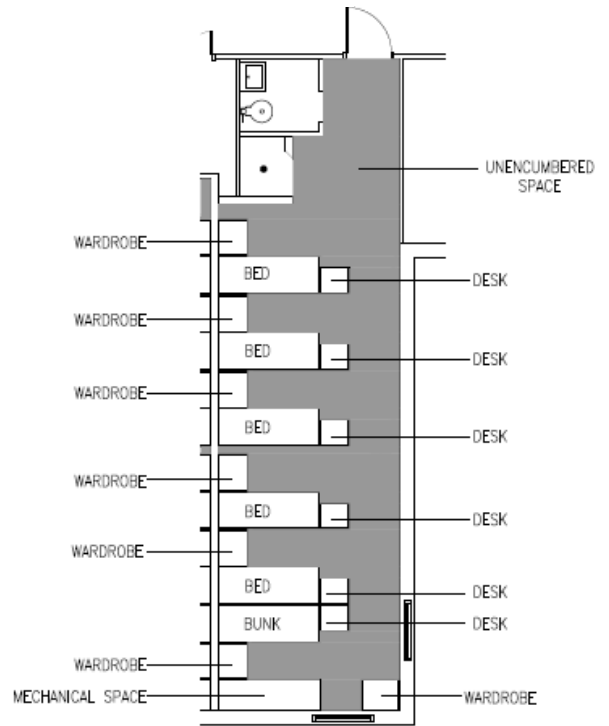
JRCC | Layouts of Existing Resident Rooms and Dorms
